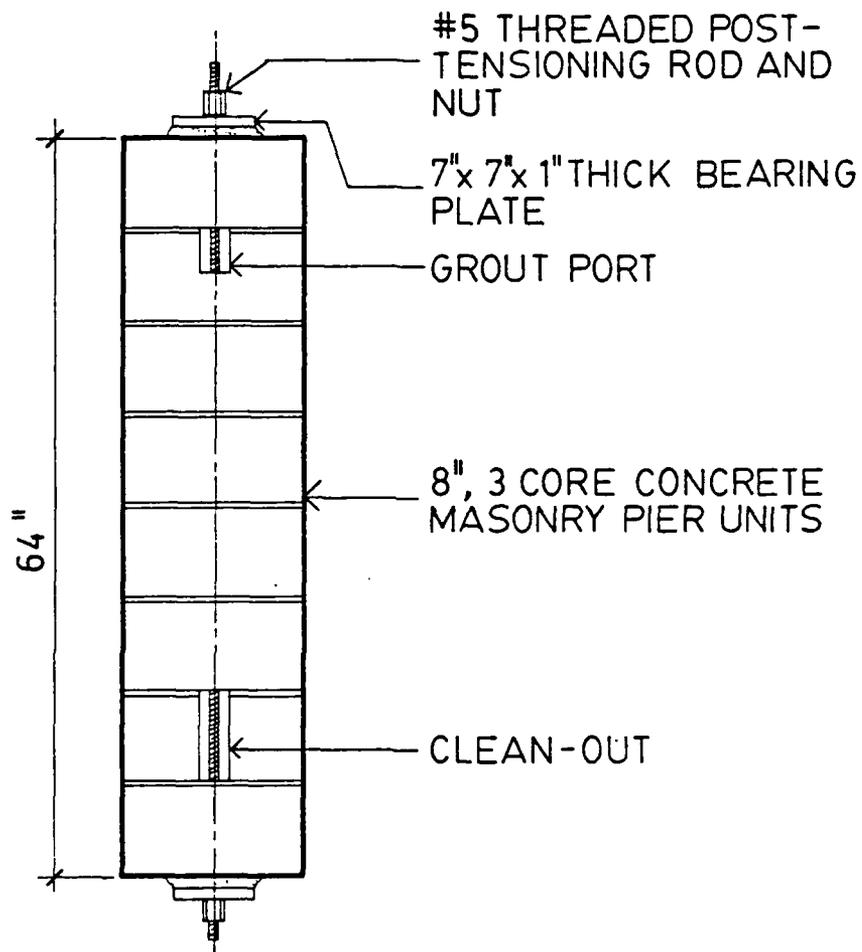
Typical Post-Tensioned Masonry Wall Panel.
